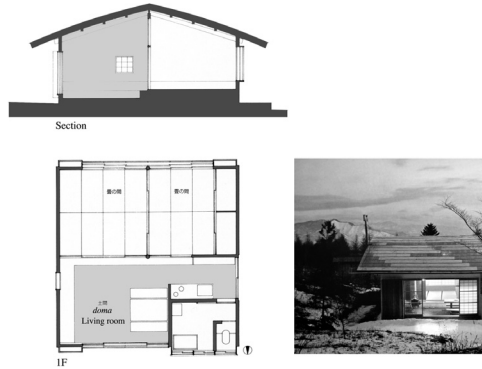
Shinohara Kazuo, House with an Earthen Floor, Nagano, 1964. Main façade (photograph ©Ōtsuji Kiyoji), plan and section adapted by the author from Shinohara 1996.
